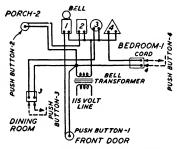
Wiring Diagram of Bell Signal System in 1½-Story Building
